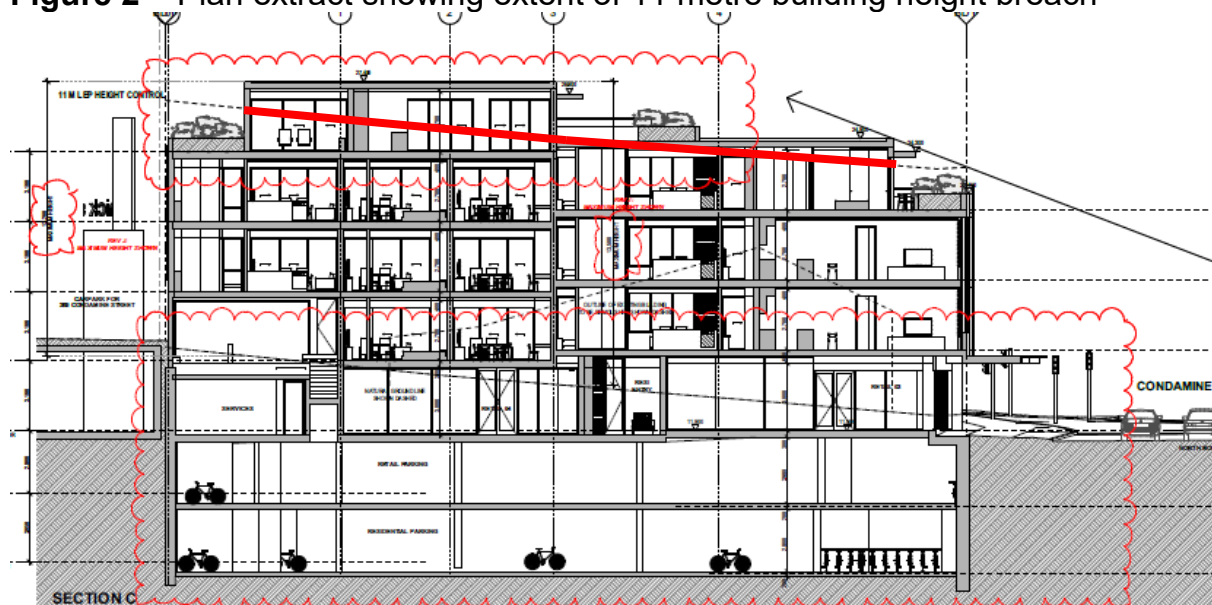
Plan extract showing extent of 11 metre building height breach in section
